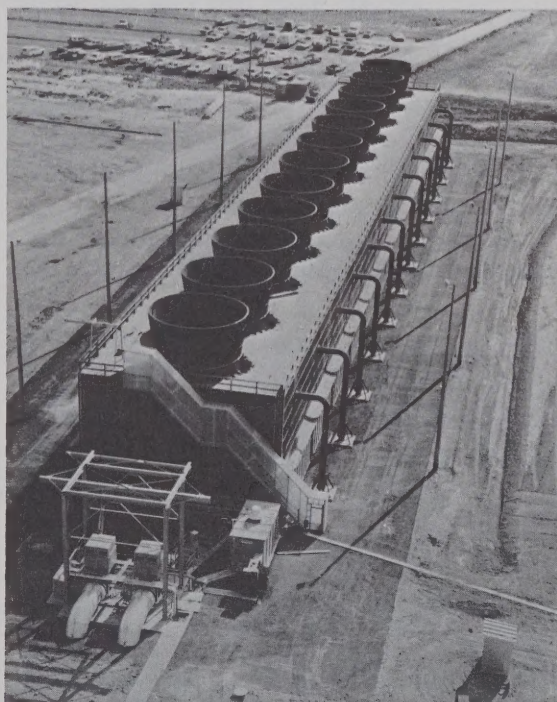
An induced draft, counterflow cooling tower is used at the Utah Power and Light Company's 200-megawatt Naughton No. 2 Unit, located near Kemmerer, Wyoming. The approximate dimensions of the cooling structure are: length 360 feet, width 48 feet, and height 31 feet.
